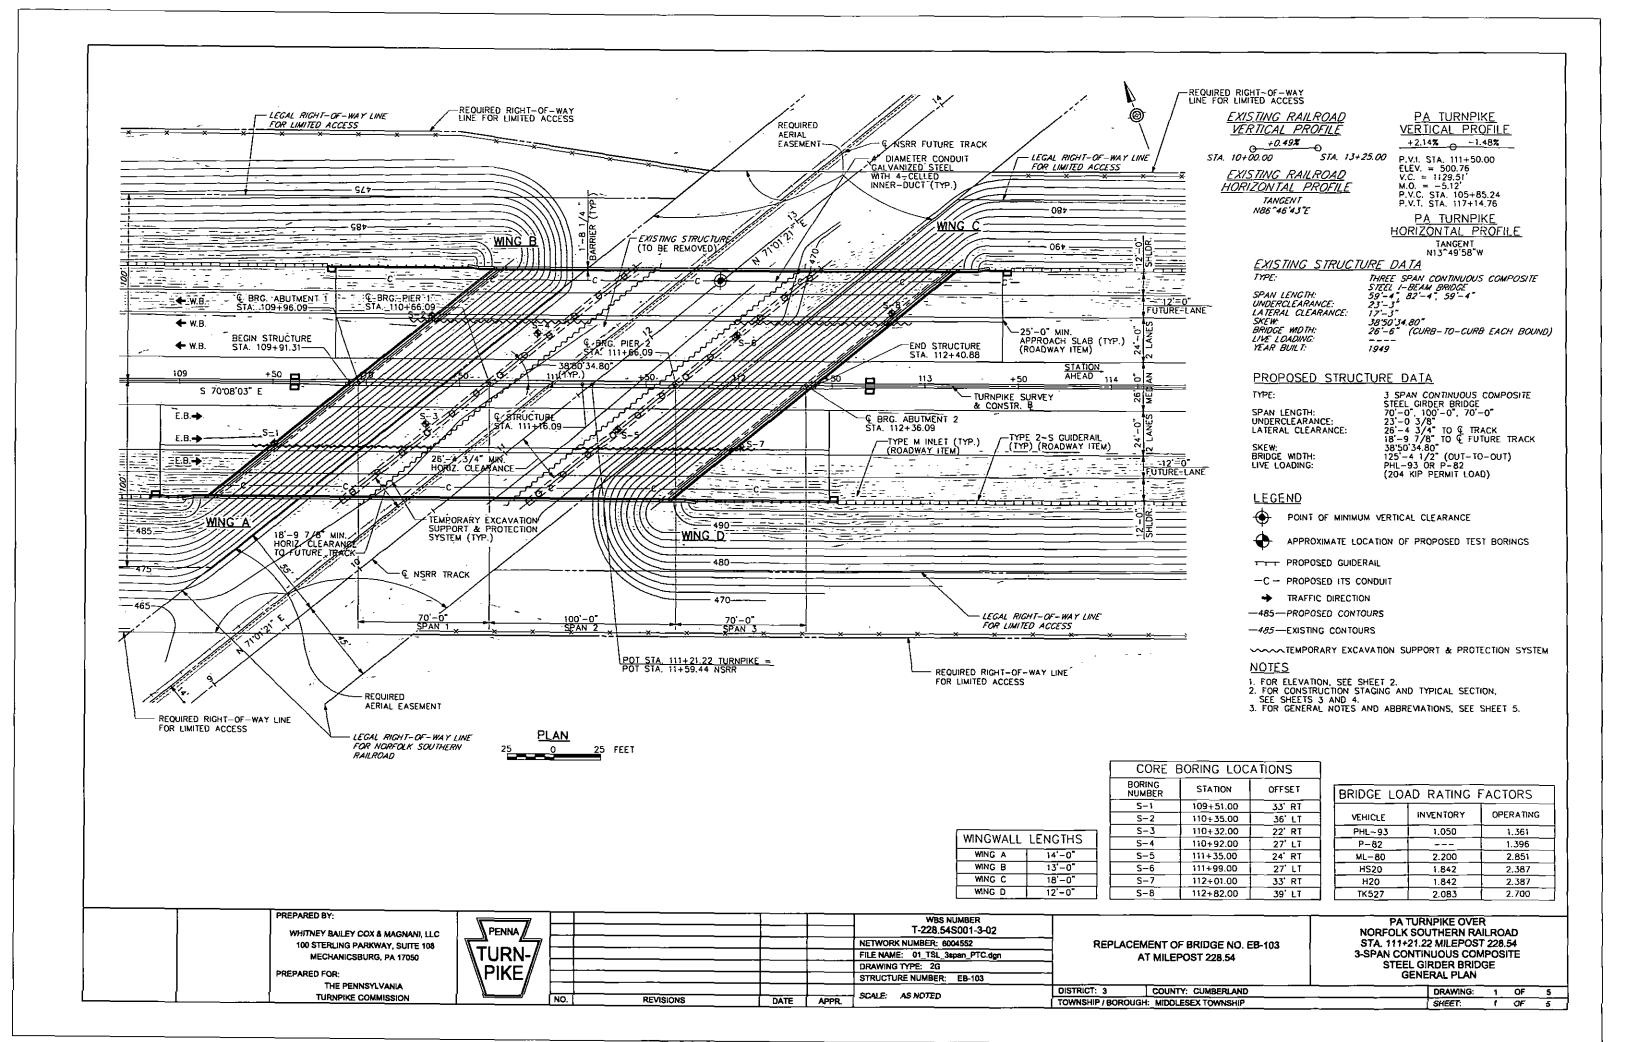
EXHIBIT C – BRIDGE TYPE, SIZE AND LOCATION PLANS
